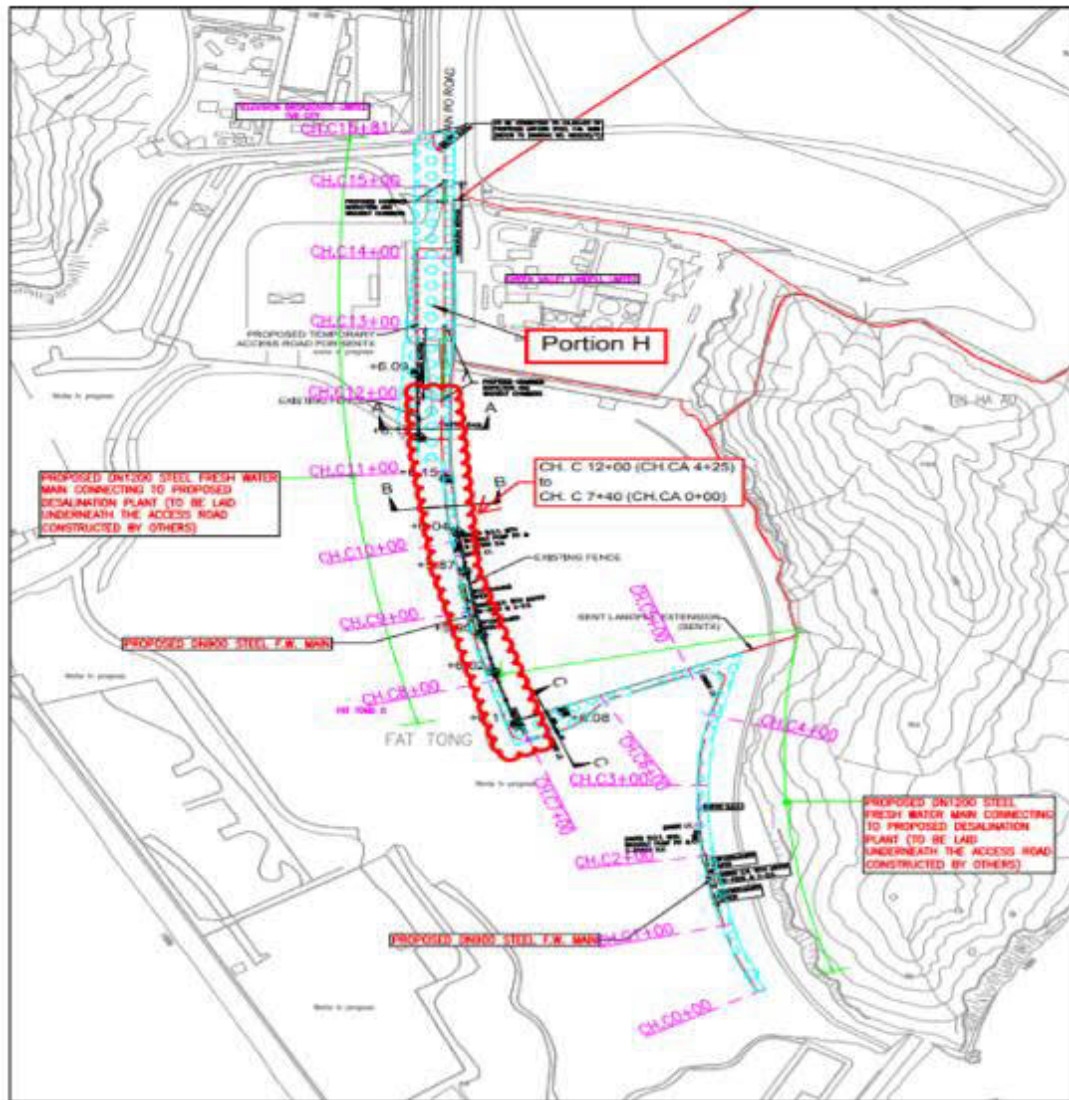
Location Plan for Portion H– CH.C 7+40~CH.C 12+00 (CH.CA 0+00 ~ CH.CA4+25)
